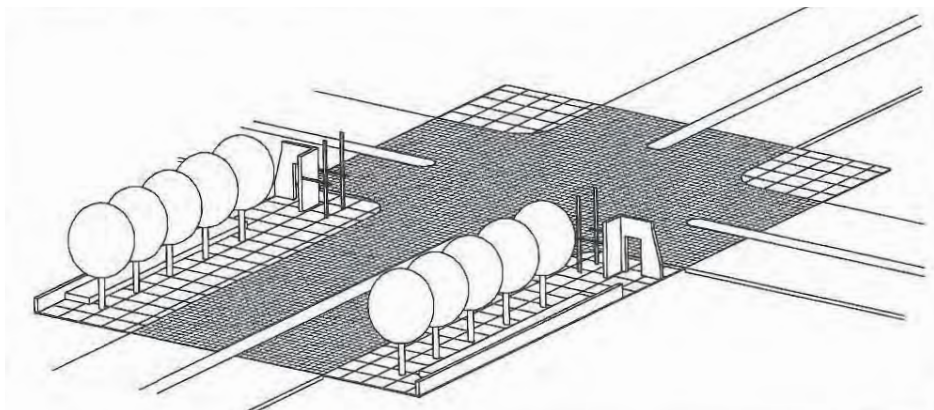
Proposed gateway plan (Source: Author, Le Grange & Dewar et al., 2004).
